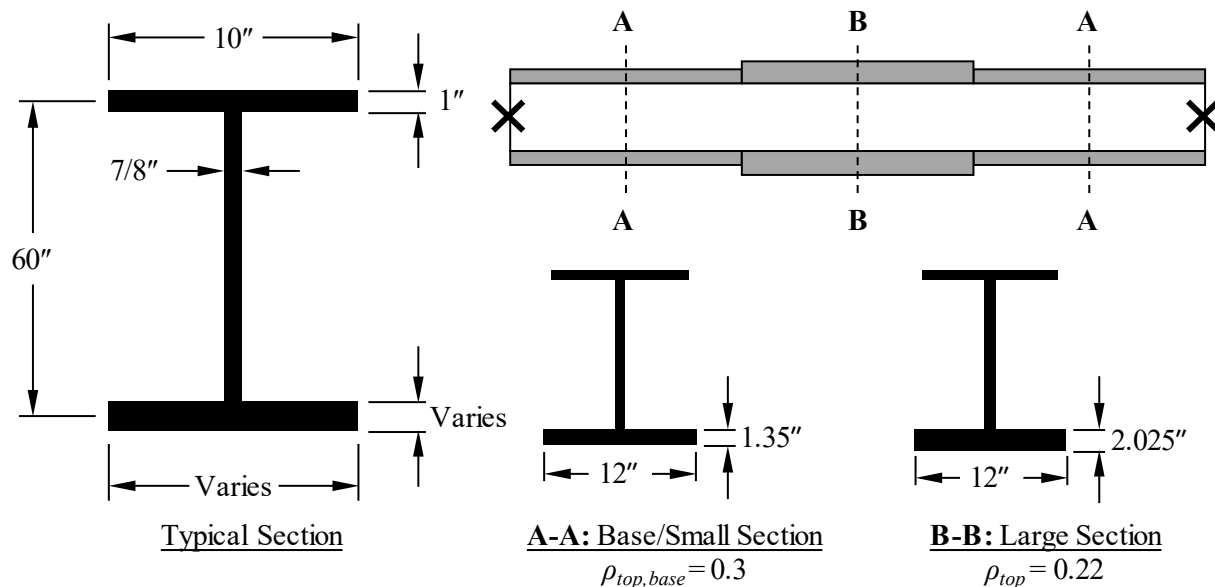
Typical cross-section used in the parametric study and an example showing how a simply-supported nonprismatic girder with flange transitions is developed
